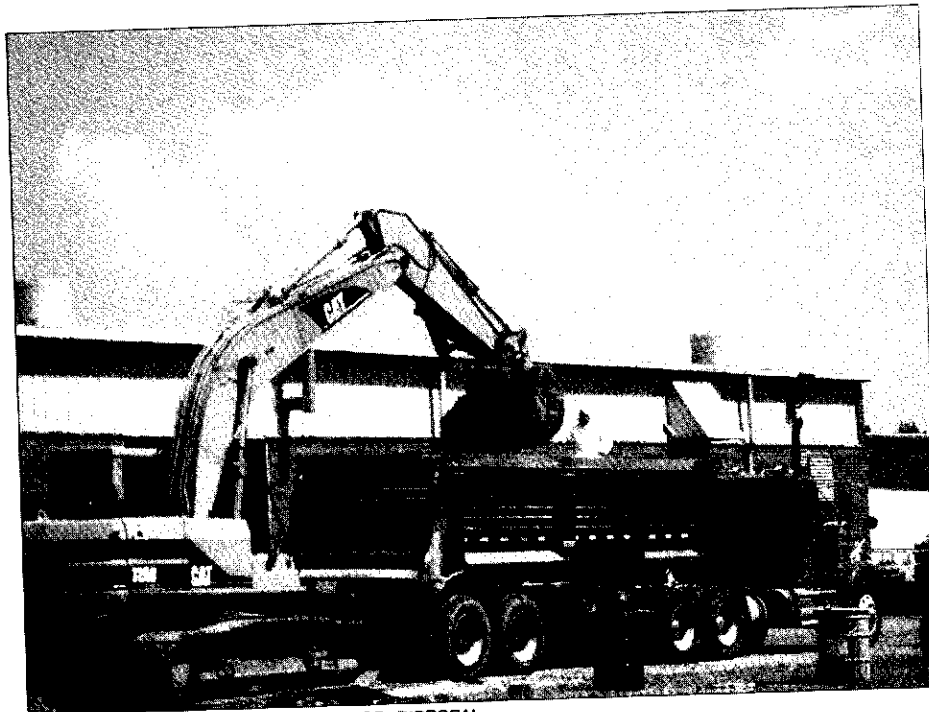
LOADING OF CONTAMINATED SOILS FOR DISPOSAL
